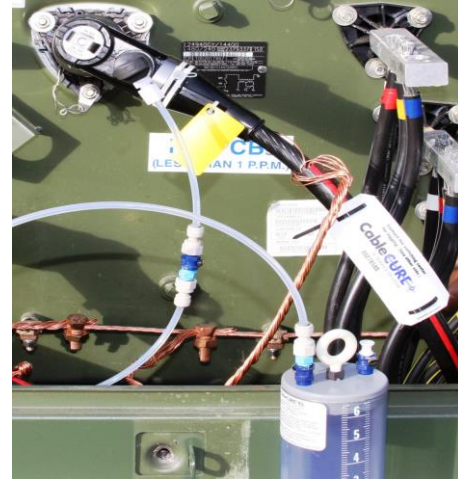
Install the discard control system and regularly check to ensure an adequate vacuum.
